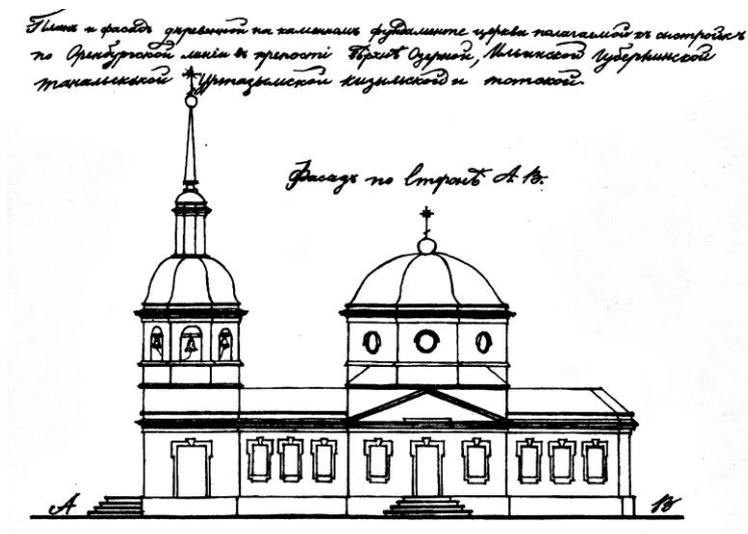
Exemplary wooden church for the Orenburg Defence Line, on a stone foundation: façade
